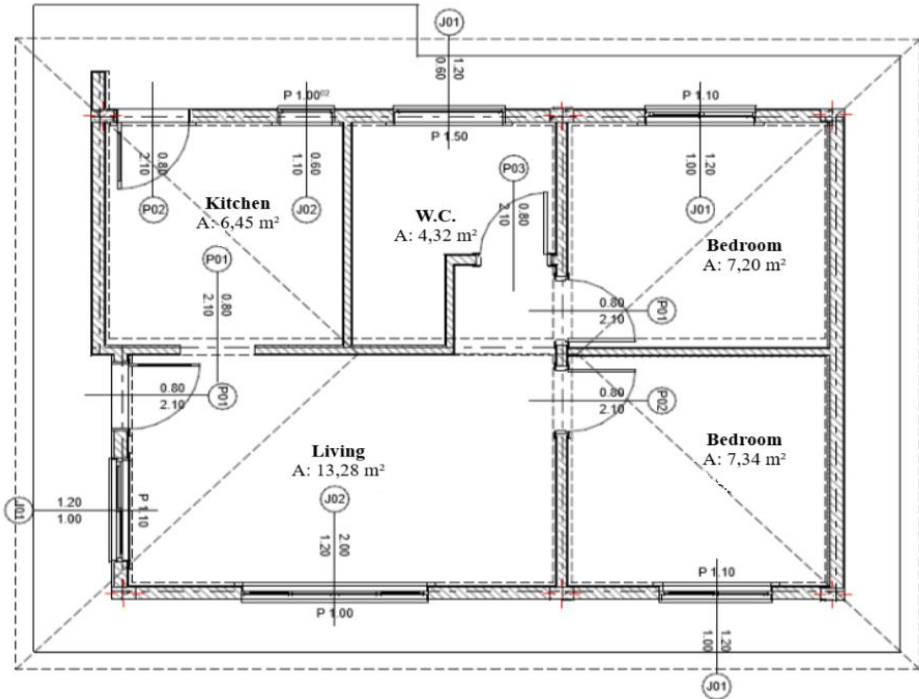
Floor plan of HU, MG-91-I-2-45 Standard from COHAB Minas [10, adapted]
